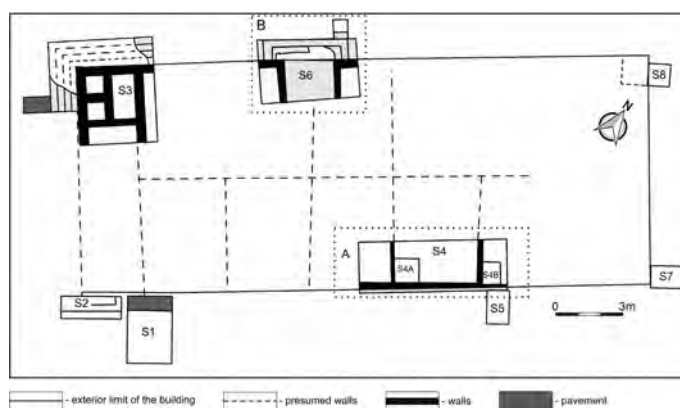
1. Building plan of C9 (Tiberiu Vasilescu).
